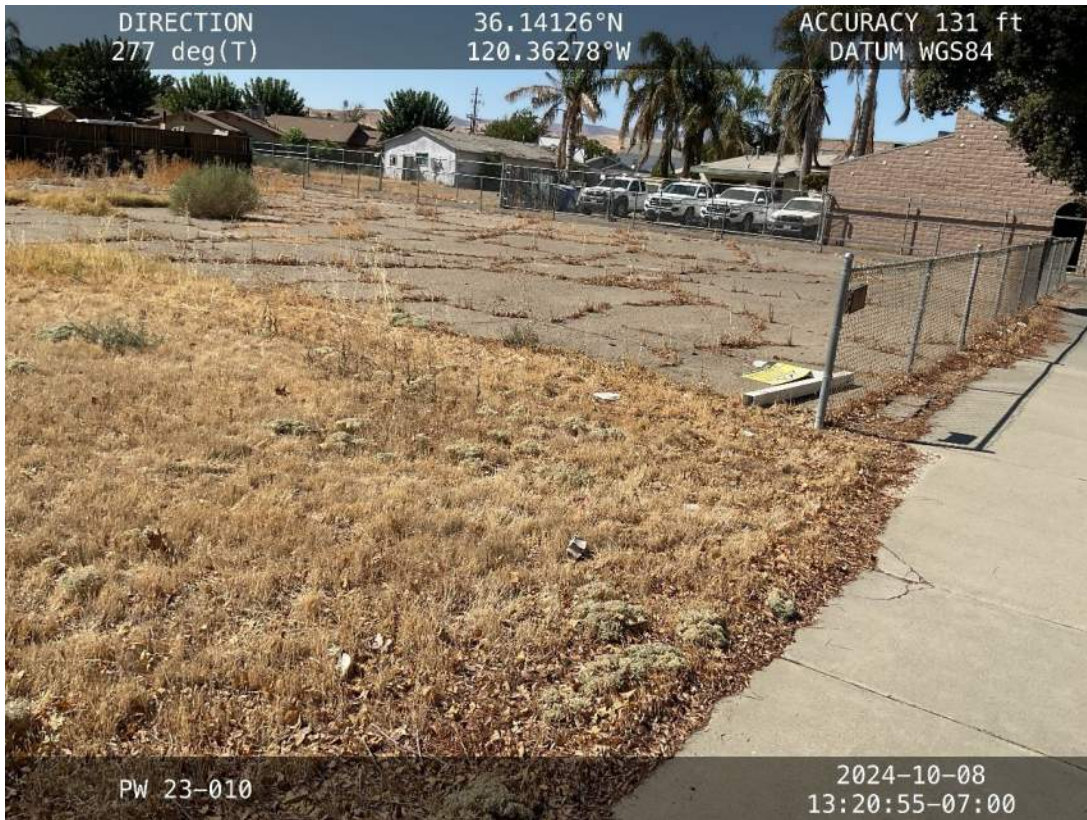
On-site. Facing North-West. On Coalinga Plaza.
